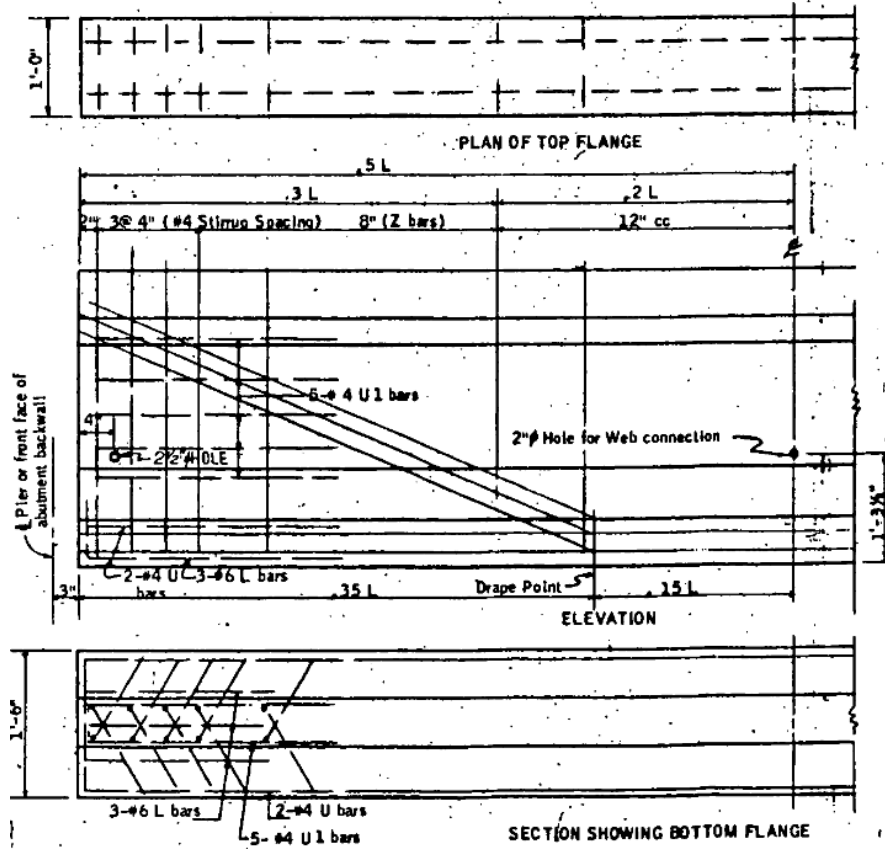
Elevation and bottom flange plan views of Beam "A" and Beam "C"
